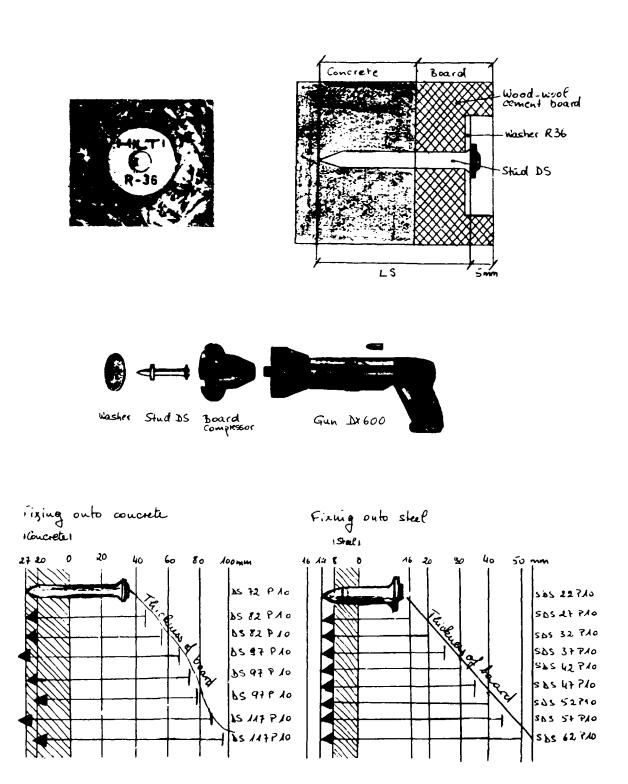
Patented system of fixing the wood-wool cement board onto e concrete wall (ring with appropriate stud).
